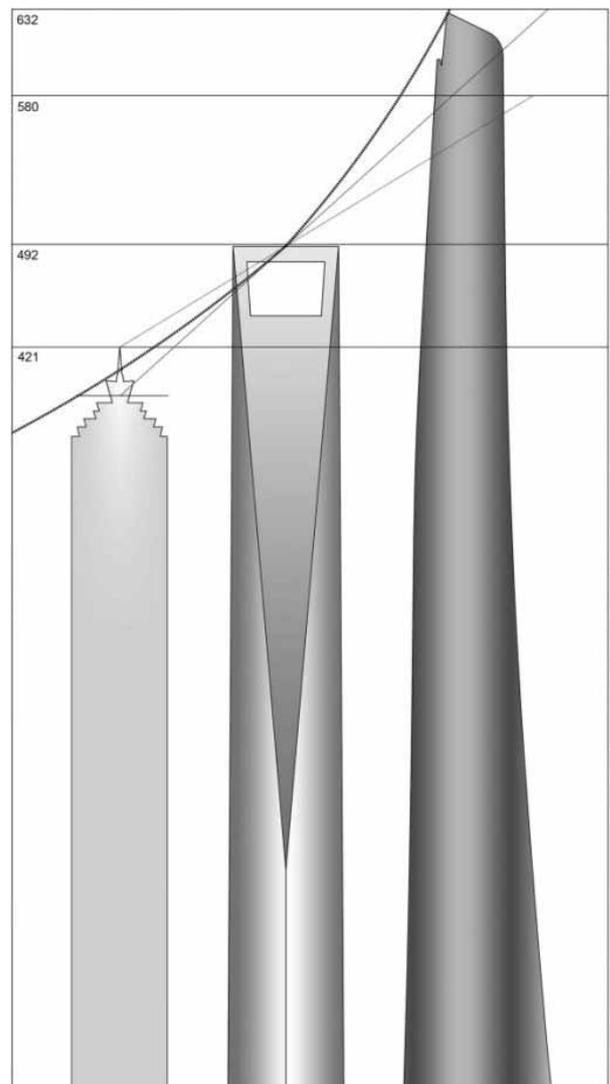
Jinmao Tower, Shanghai World Financial Center & Shanghai Tower (Source: Shanghai Tower Construction & Development Co., Ltd)
